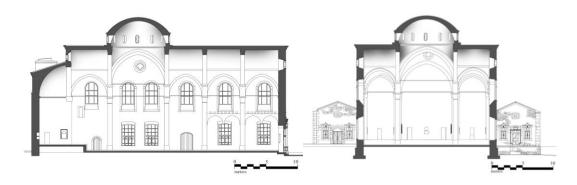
Section views of Surp Yerrortutyun Church from the central axis (Source: reconfigured by the author)
